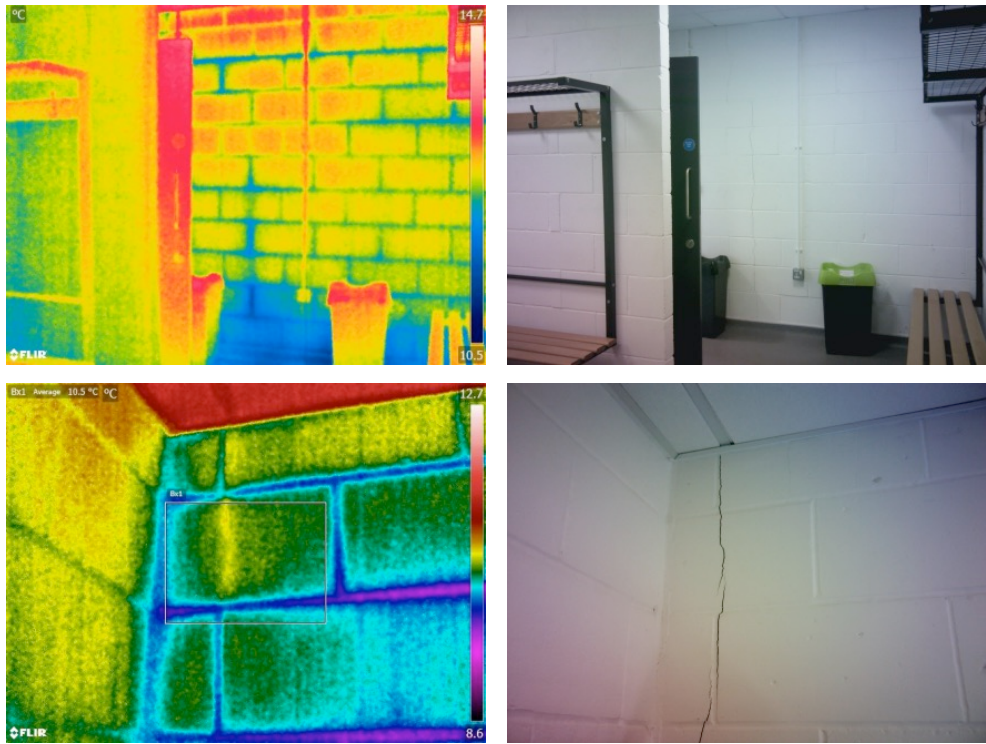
Thermal images and digital images of cracks in the internal wall (changing room 3)
